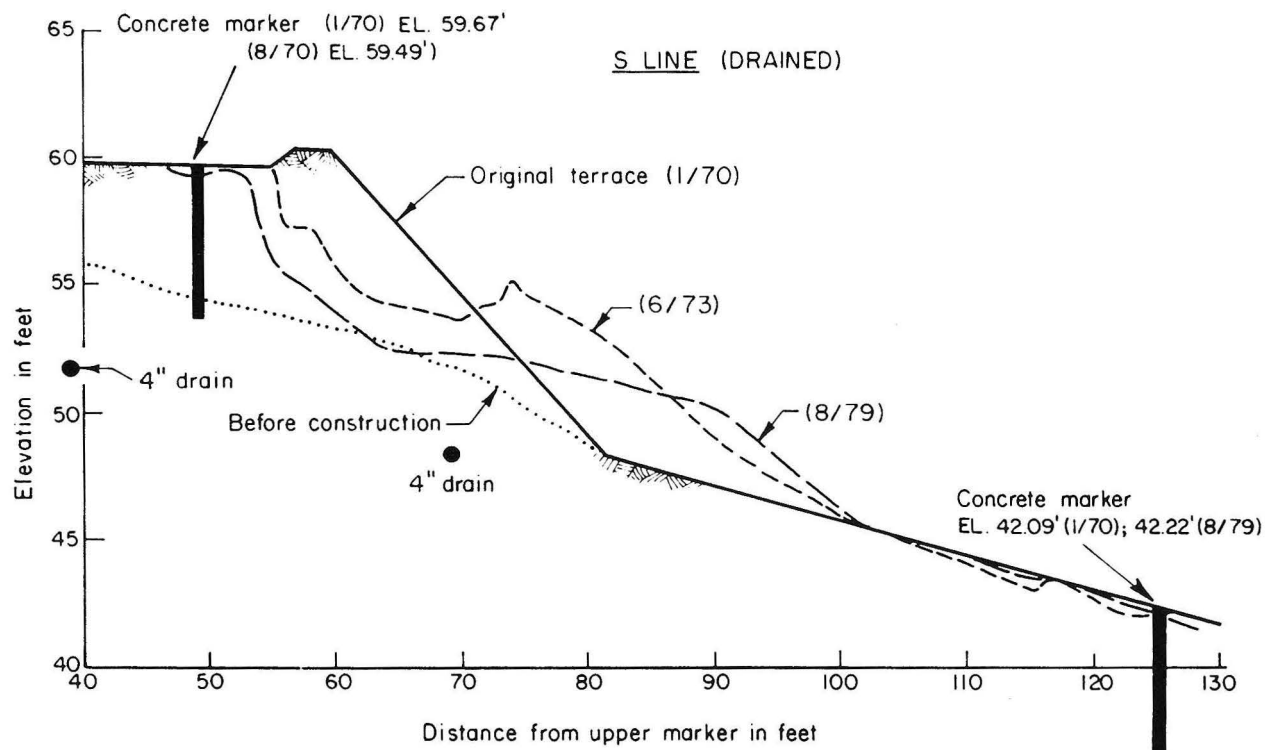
Cross section of bench terrace through drained end (S) before and after failure.
